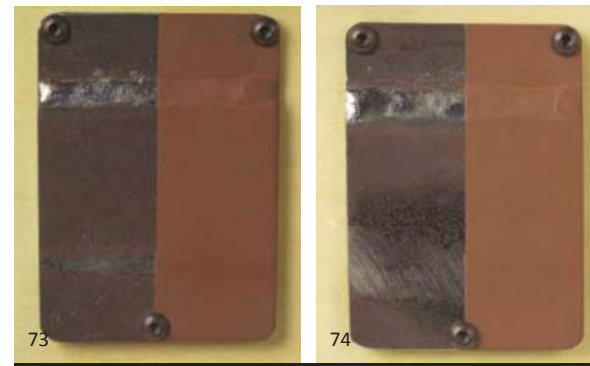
Weld show through minimized. The left hand images shows weld show through from a connection on the far side of the plate. The right hand image shows how it has been concealed. Courtesy AISC
